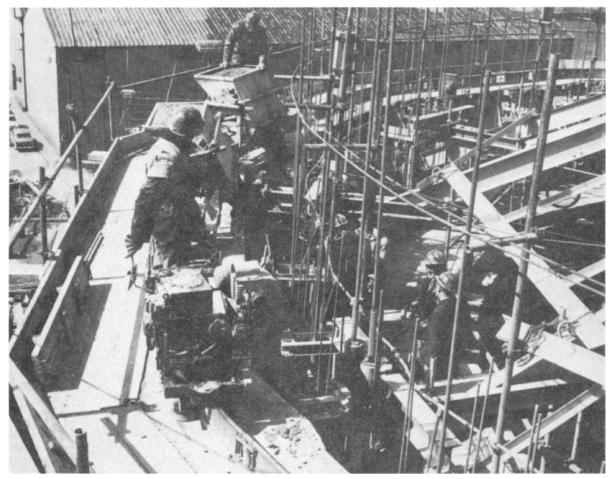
Continuous vertical construction of circular silos with sliding formwork. *Note*: sliding form; jacking points; working platform; monorail transporter distributing hoisted concrete. (*Courtesy*: John Laing and Sons Ltd)
